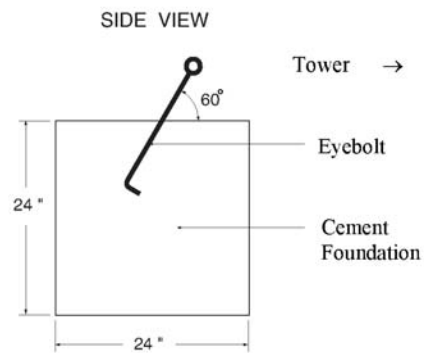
UTEYE Eyebolt Guy Anchor
